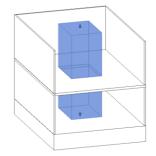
REVIT BIM MODEL – ATRIUM SPACE AS SHAFT OPENING AND WITH ROOF AND FLOOR COVERING THE WHOLE BUILDING FOOTPRINT – 3D VIEW
